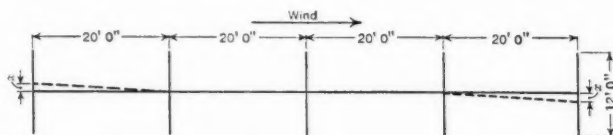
TYPICAL FLOOR SHOWING VERTICAL DISPLACEMENT OF JOINTS DUE TO AXIAL COLUMN DEFORMATION.
